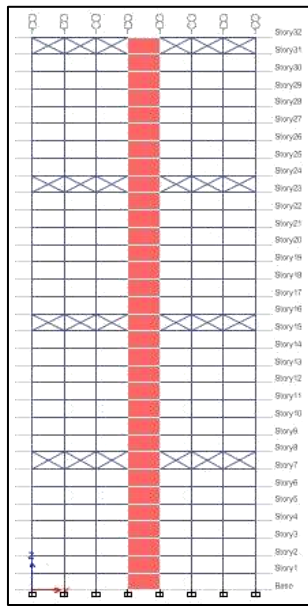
Sectional Elevation of Building Model 6 (With Steel X Outriggers)
